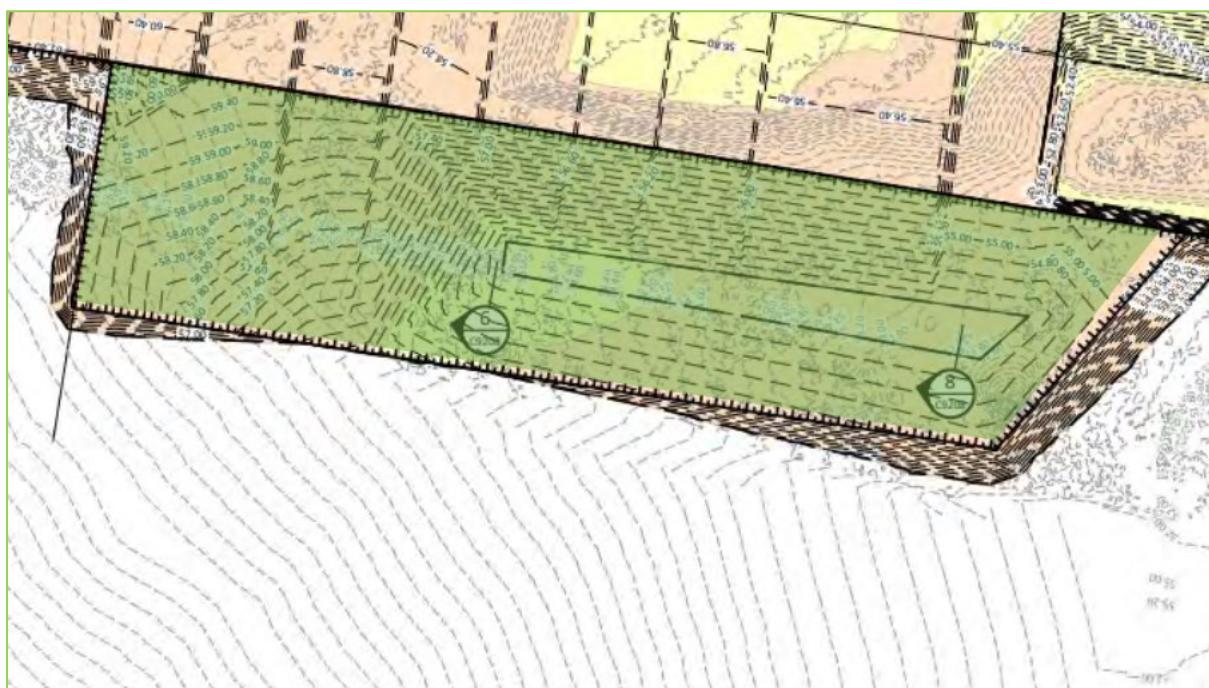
Controlled Fill Plan Sediment Basin – Green Shade
